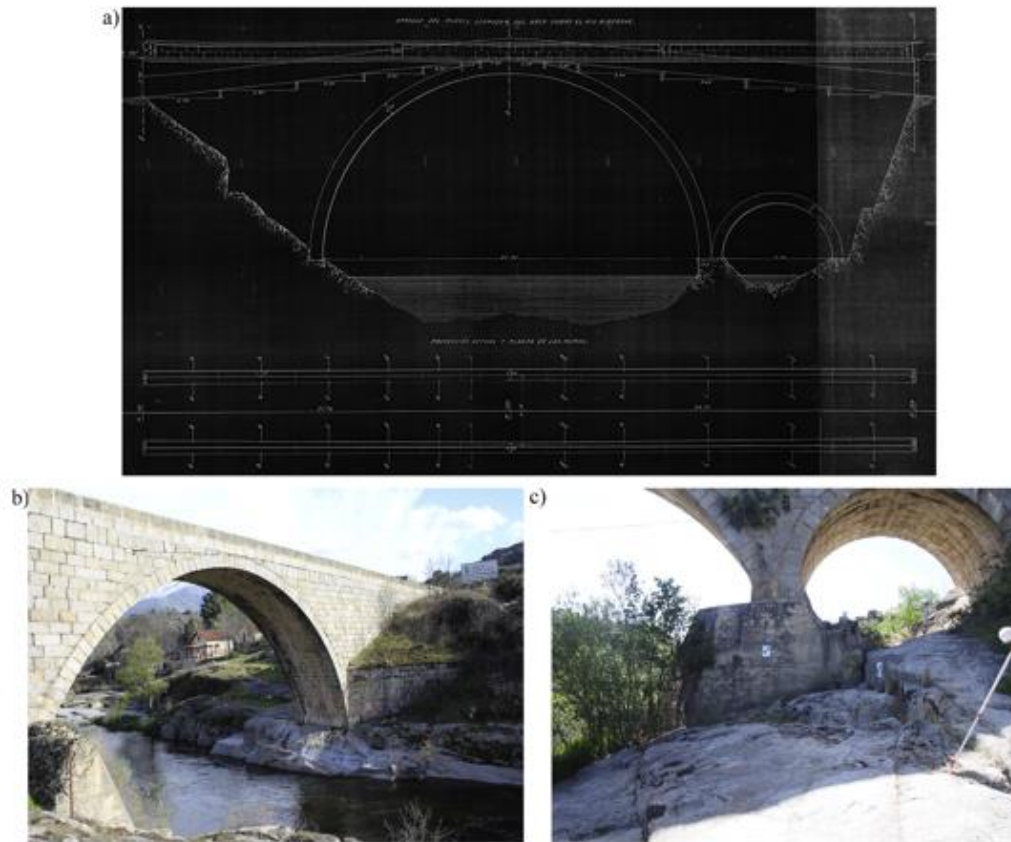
The Arco Bridge: a) downstream elevation before and after restoration works; b) upstream elevation and; c) reinforced concrete layer added to the pier between vaults.
